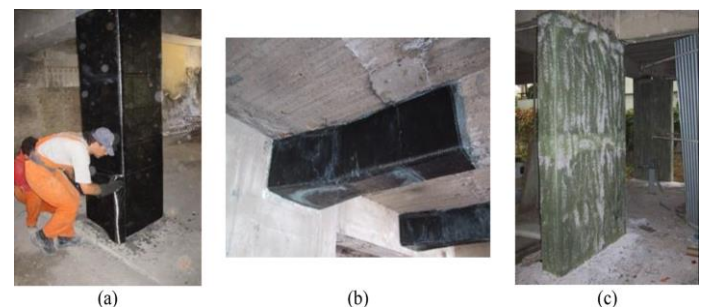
Wrapping of RC (a) columns and (b) beams with CFRP; (c) shear wall with GFRP ^[49].
